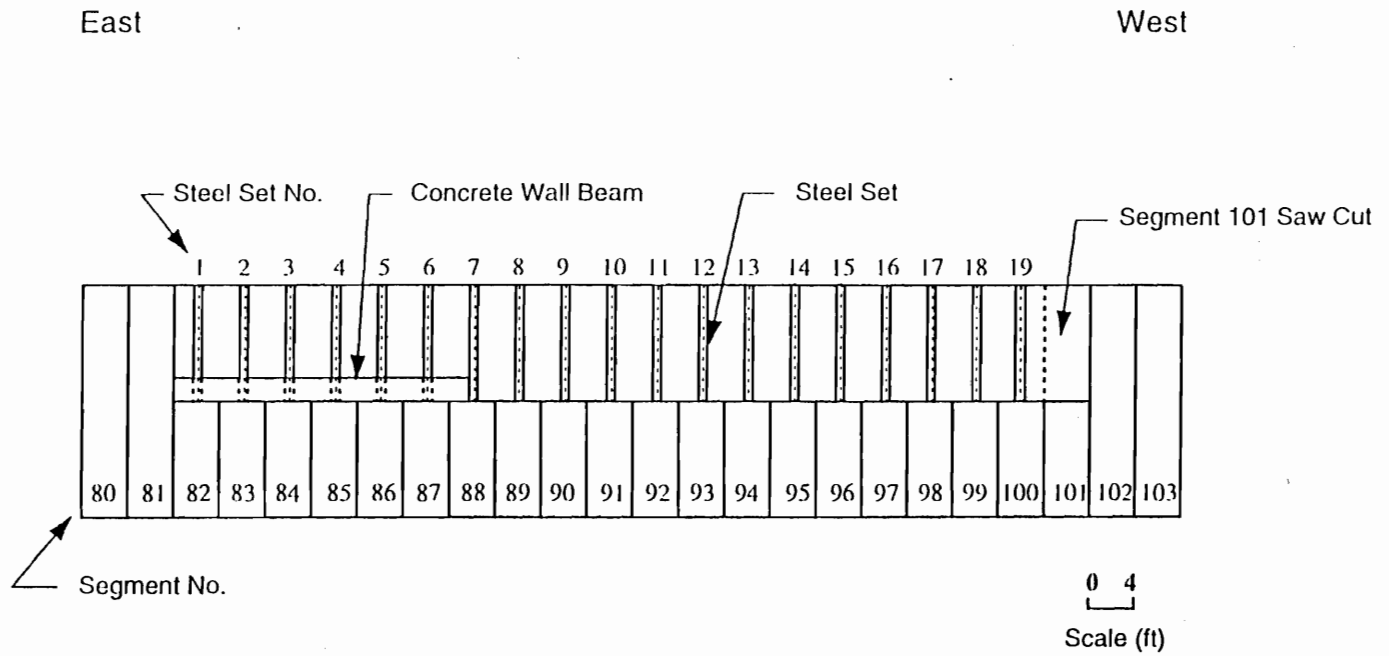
Longitudinal Cross-Section of HAL Remined Area Just Before Initial Collapse
